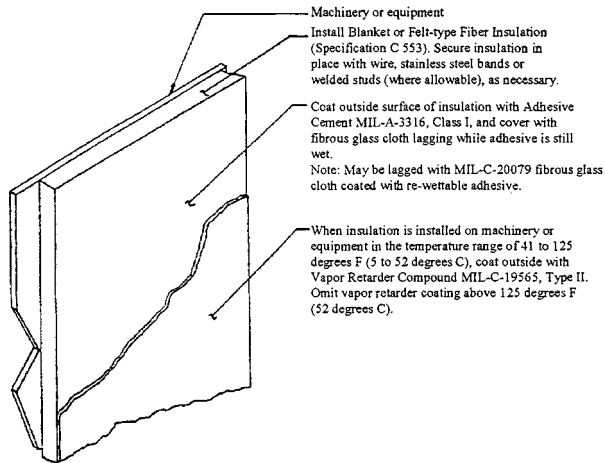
Installation of Mineral Fiber Blanket or Felt Insulation (Specification C 553) on Machinery or Equipment (400°F Max) (204°C)
